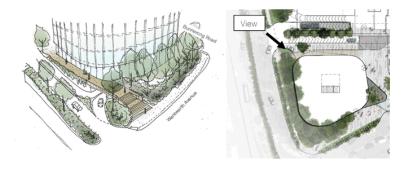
Indicative 3D and plan view of pedestrian access to the west of Building B
